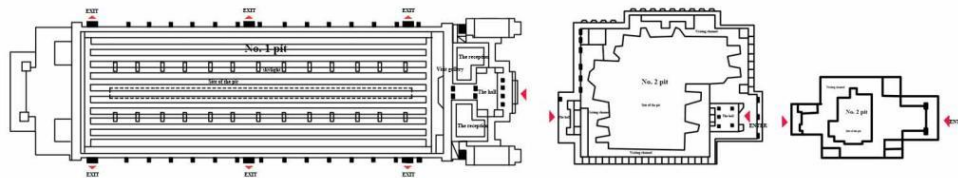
Plan figure of pit NO.1 pit NO.2 and pit NO.3
